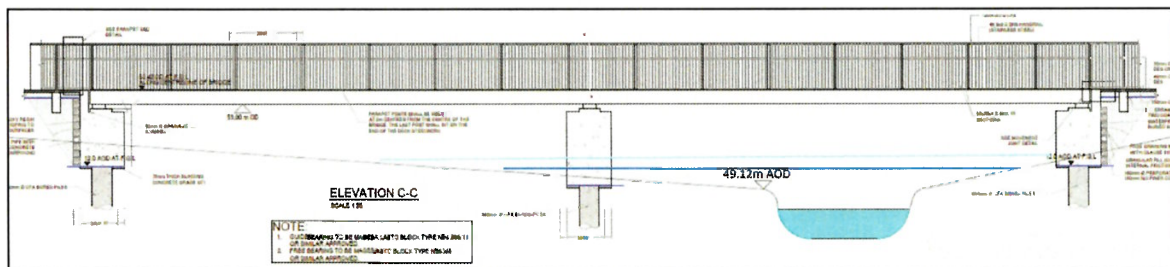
Pedestrian and cycle Bridge 3 Location
